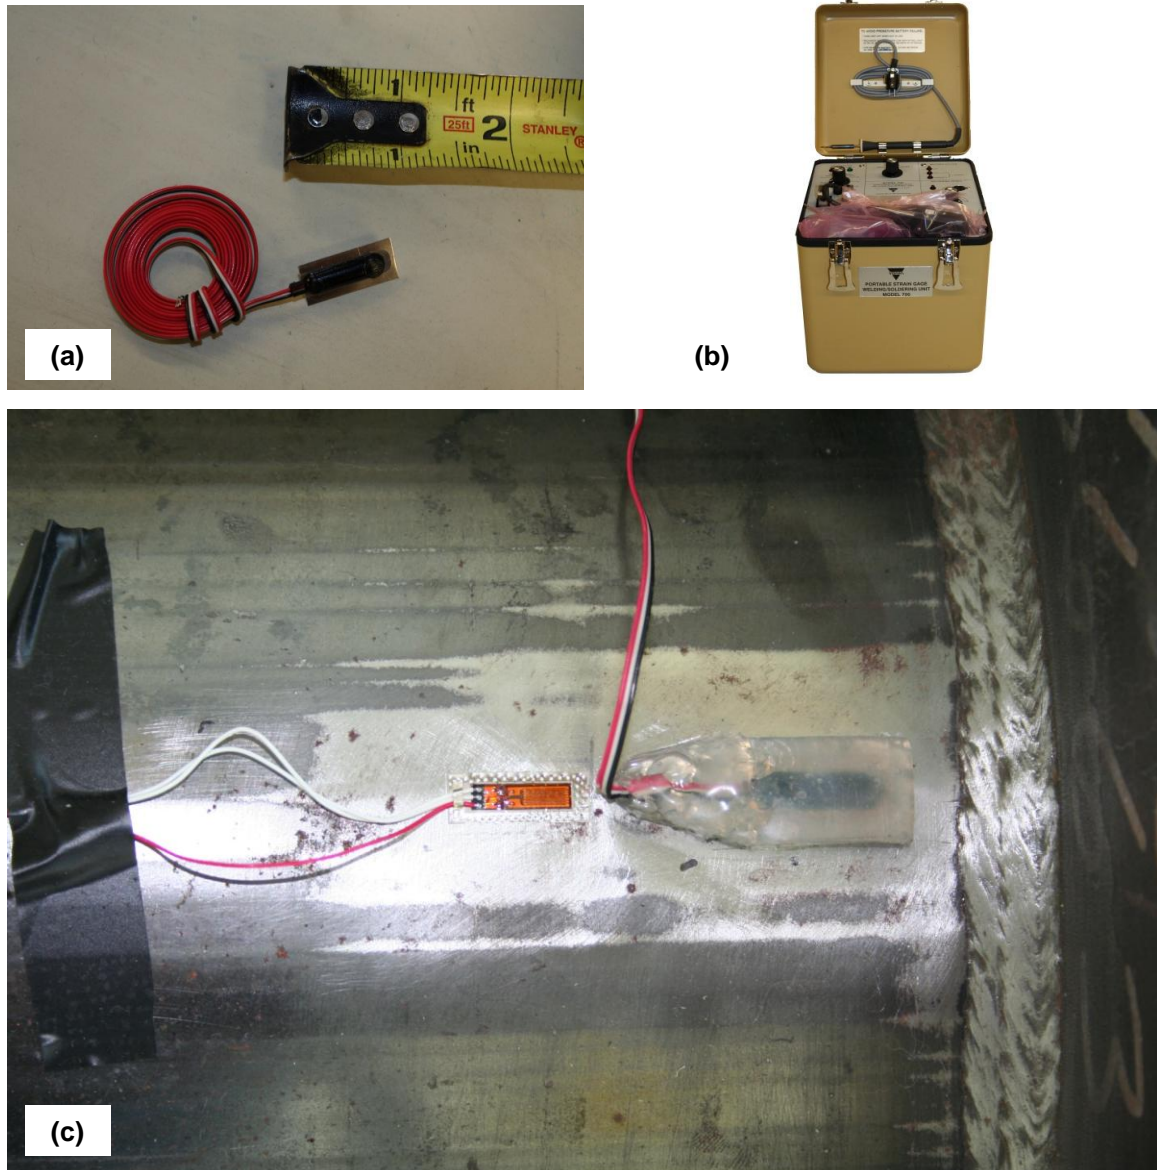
Strain Gaging: (a) Vishay strain gage, (b) Vishay spot welder, and (c) round specimen with strain gage installed.
